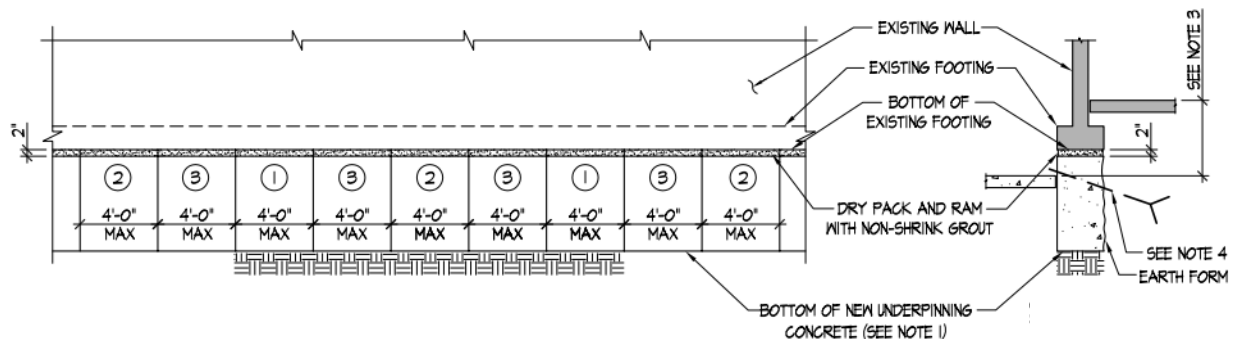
Section showing existing footing and new underpinning (right) and Elevation of sequence for underpinning: All units numbered 1 must be fully installed before excavating for placement of all units numbered 2, etc. (left), 6/S3.02
